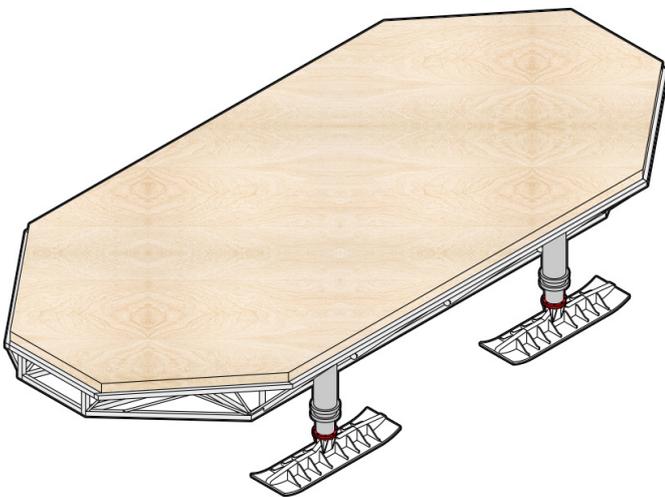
Module of structure construction- stage 3 Prefabricated timber floor being installed onto frame. Original author
